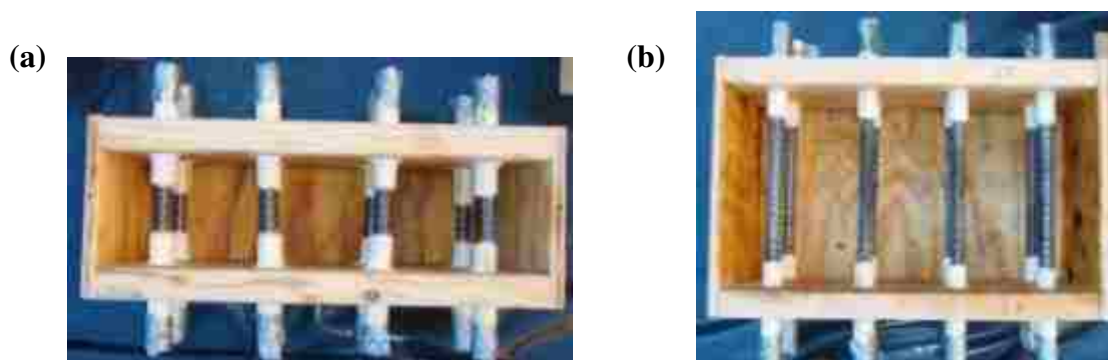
Plywood molds for: (a) small concrete block, and (b) large concrete block.
